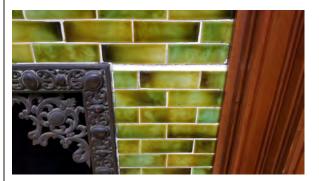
Displaced ceramic tiles on top corner of fireplace surround.
